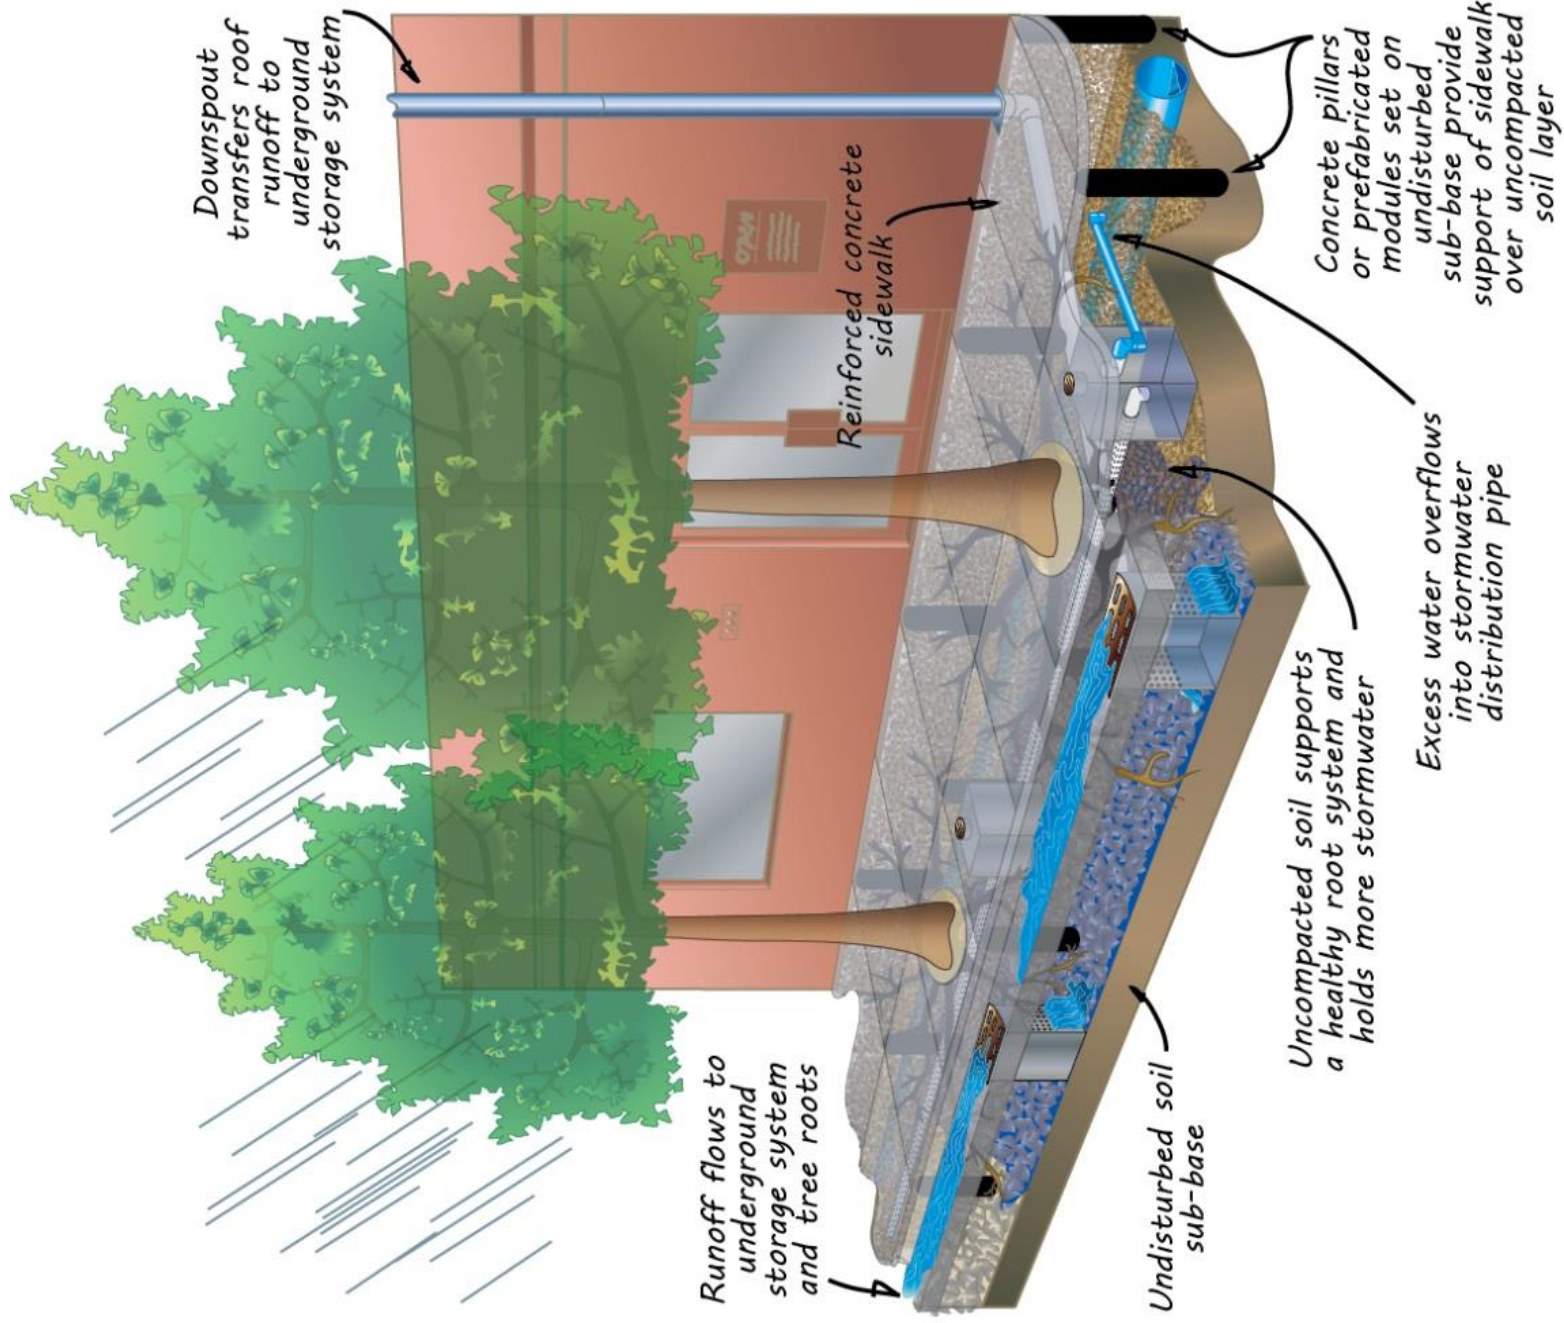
Suspended sidewalks use pillars or structured cell systems to support reinforced concrete, increasing the volume of uncompacted soil in subsurface planting areas and enhancing both root growth and stormwater storage.
